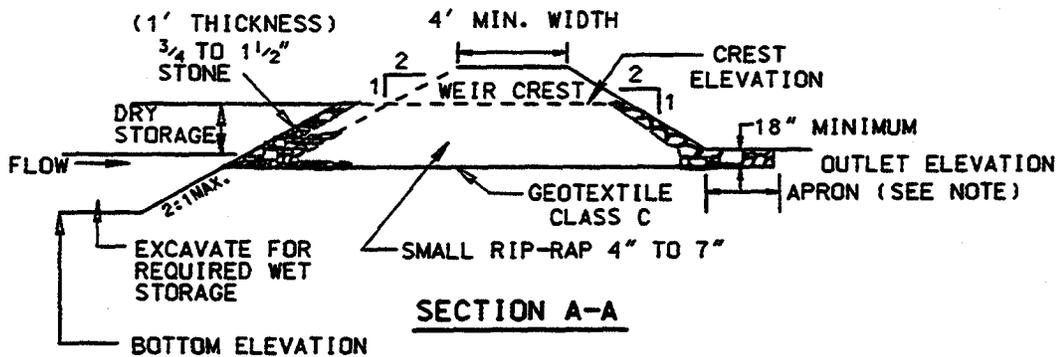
A - STONE / RIP-RAP OUTLET SEDIMENT TRAP - ST IV
